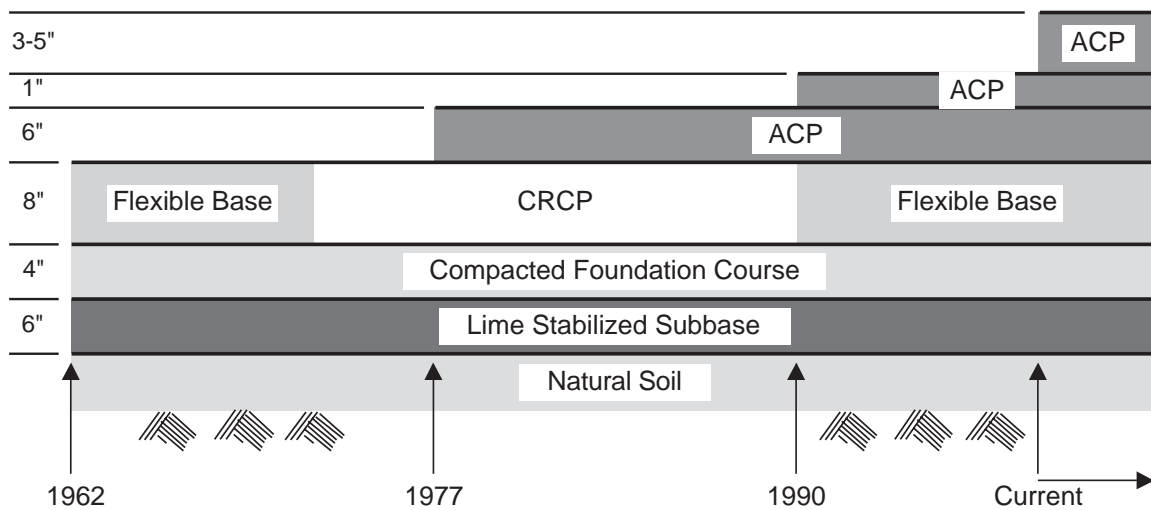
Cross-section showing the evolution of the existing pavement in Hillsboro, Texas
